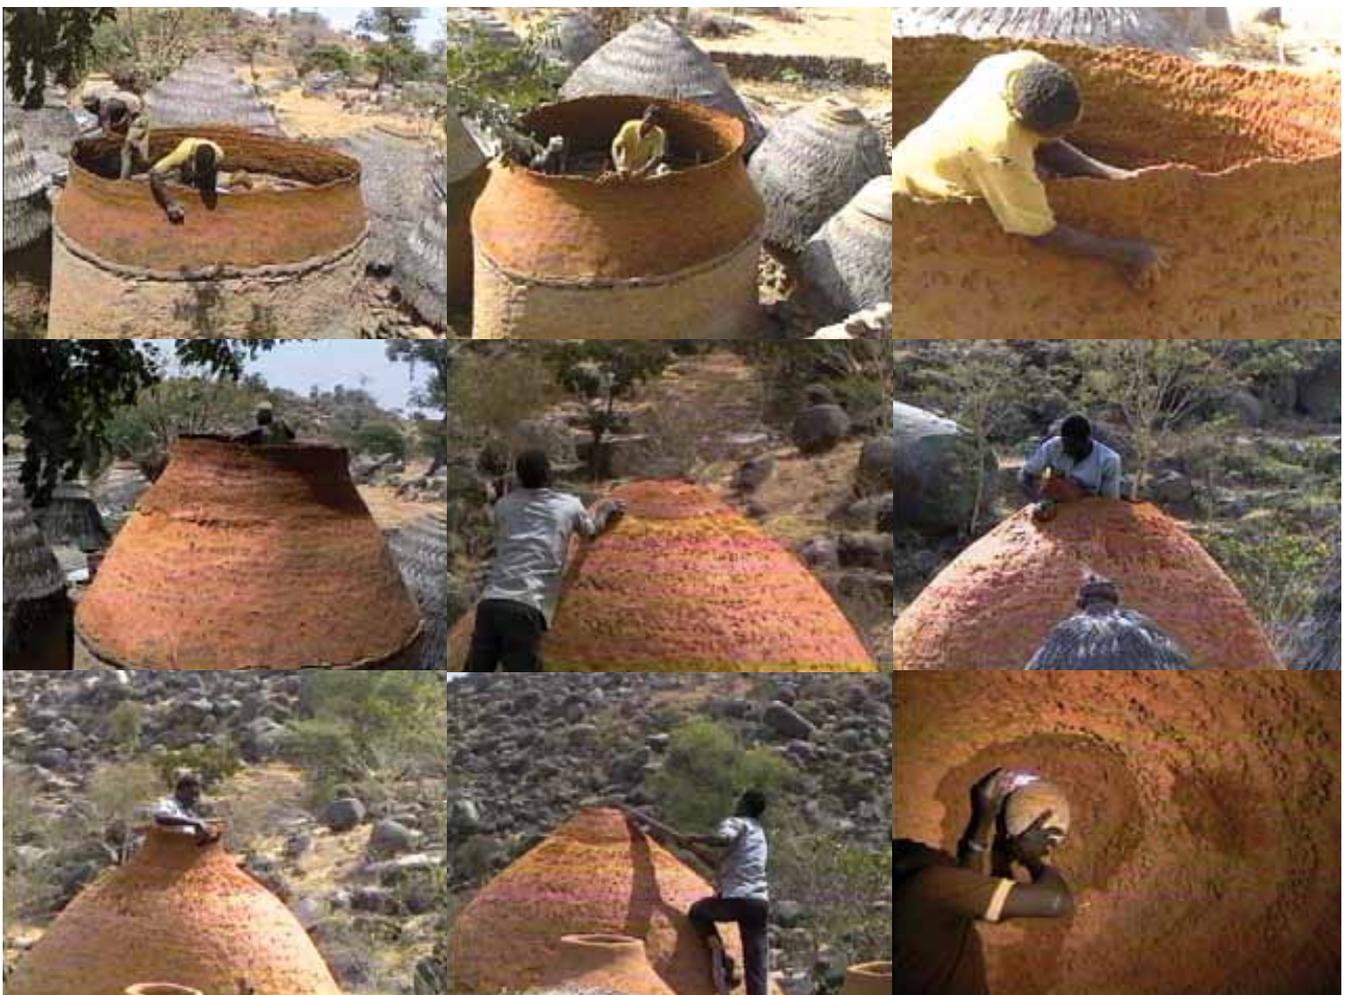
Construction of a Sakun vaulted ceiling, or *huruk*. © David, 2010
